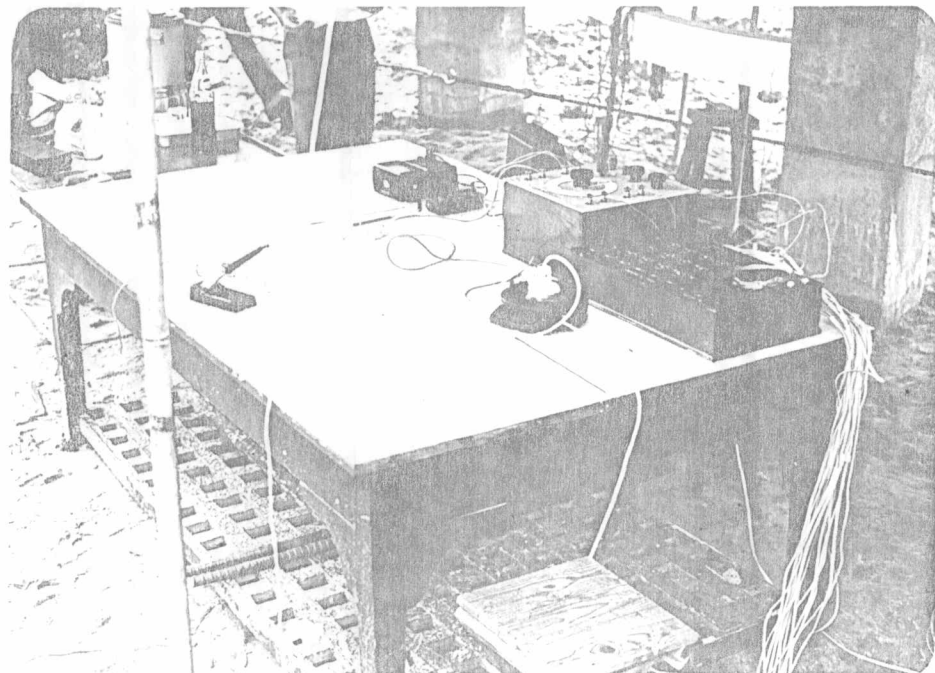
Z-beam Model; A View Showing Arrangement for Embedment of Electrical Strain Gauge in Beam.
